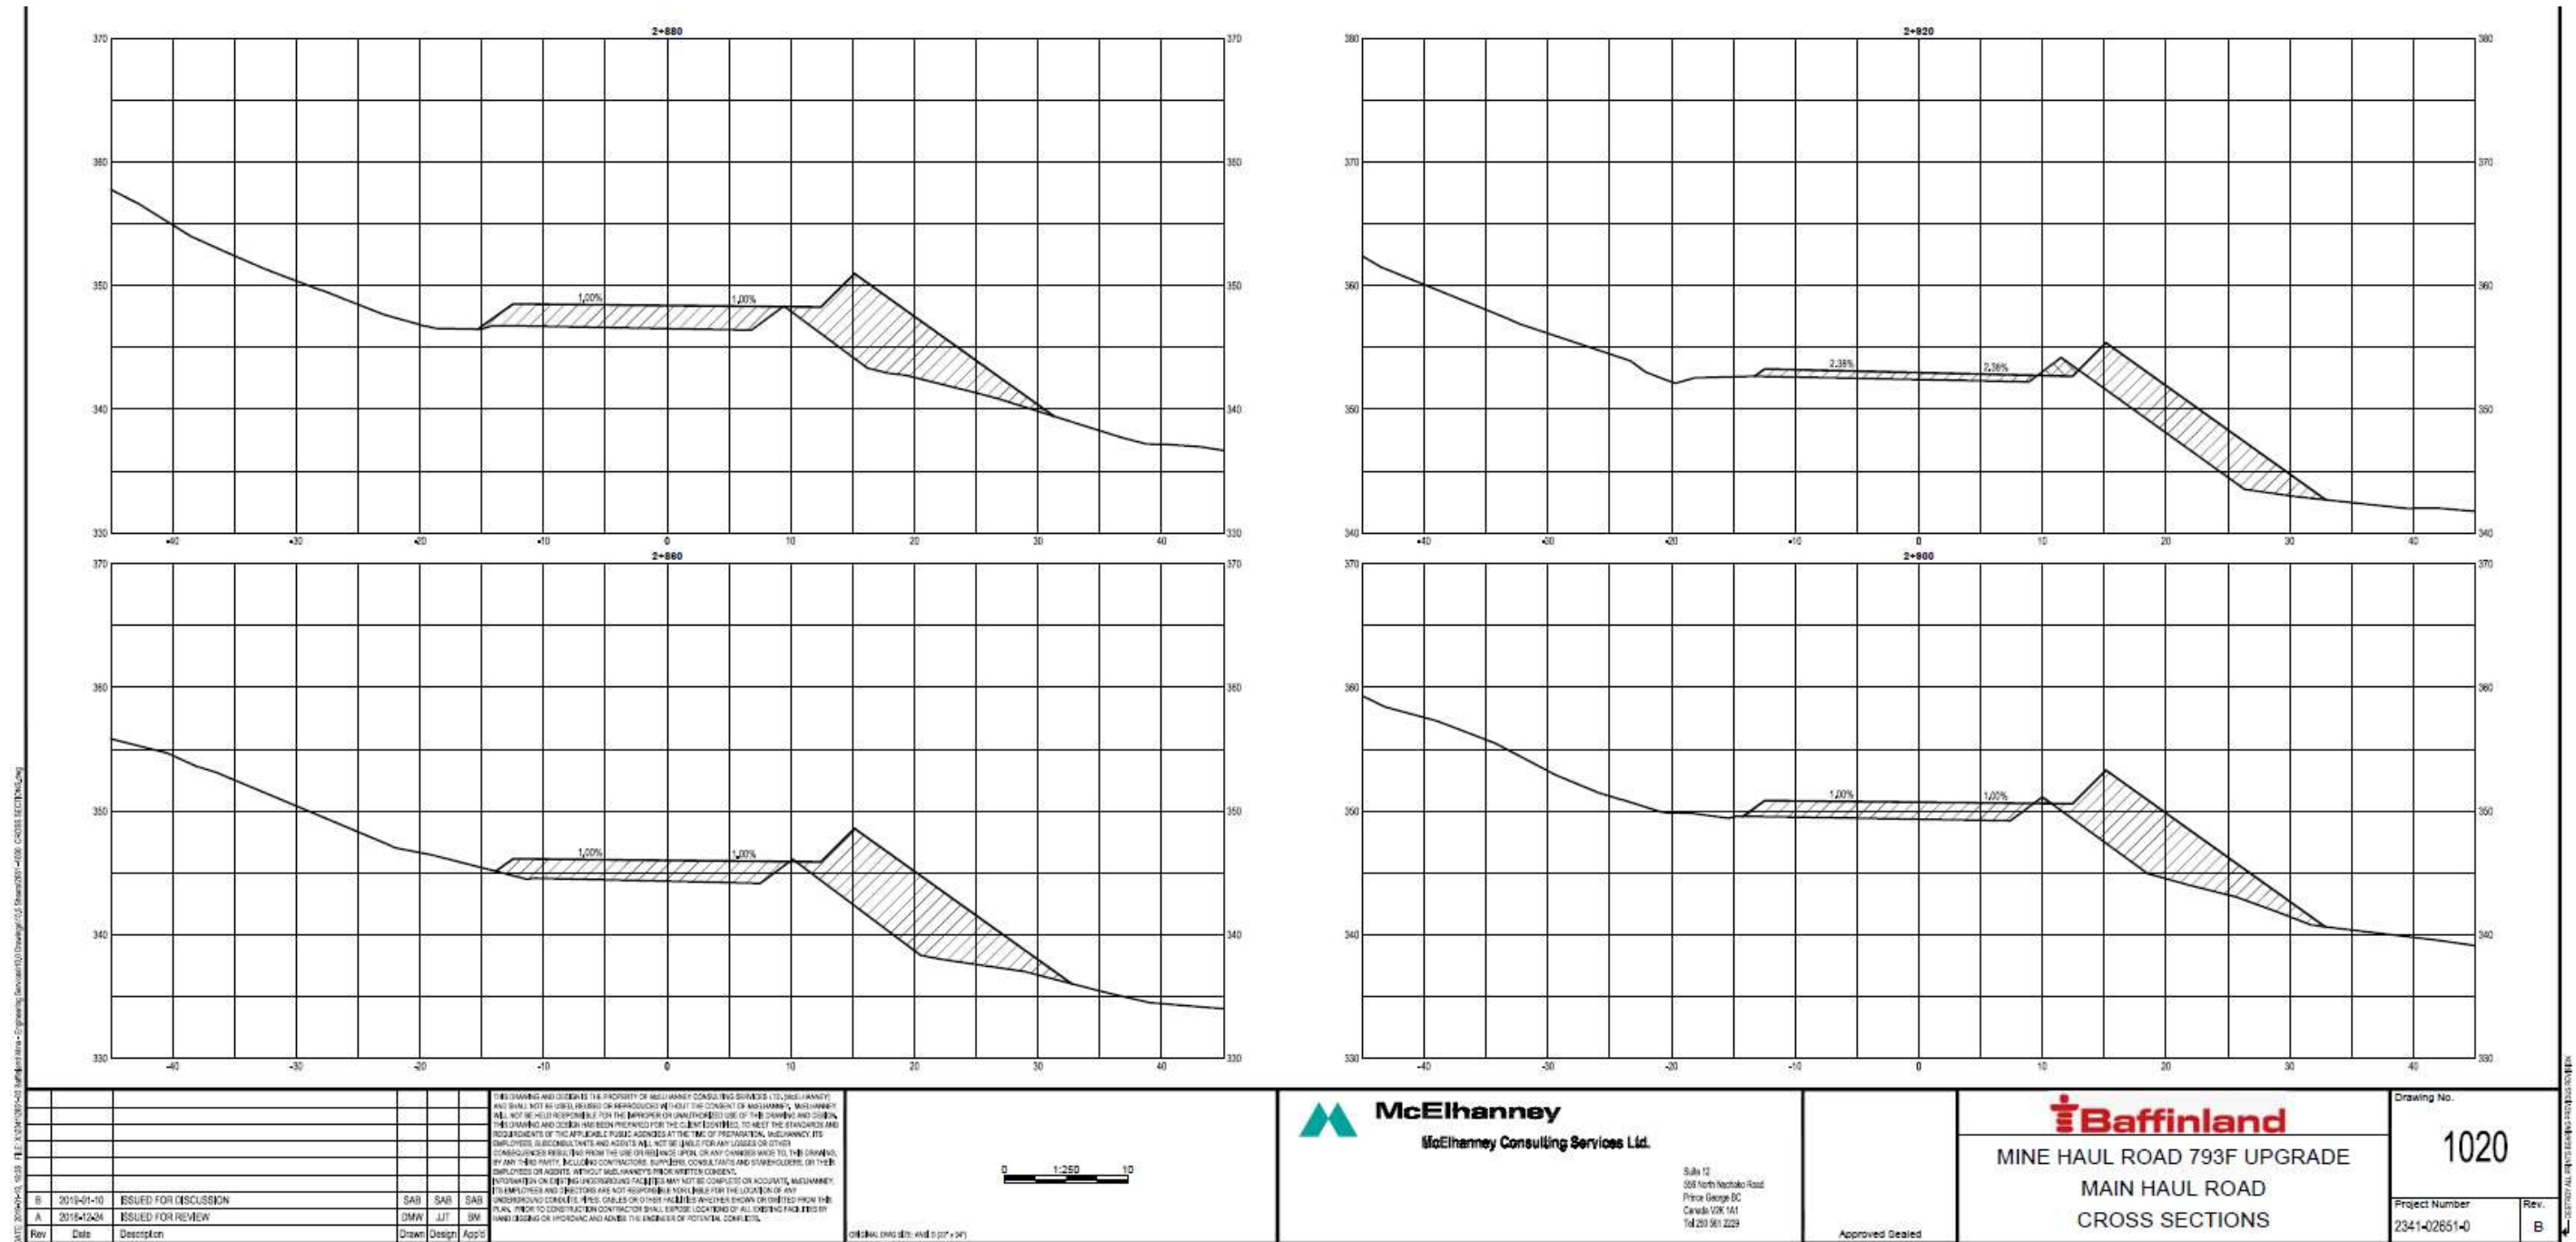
Mine Haul Road Upgrade Cross Section Examples
